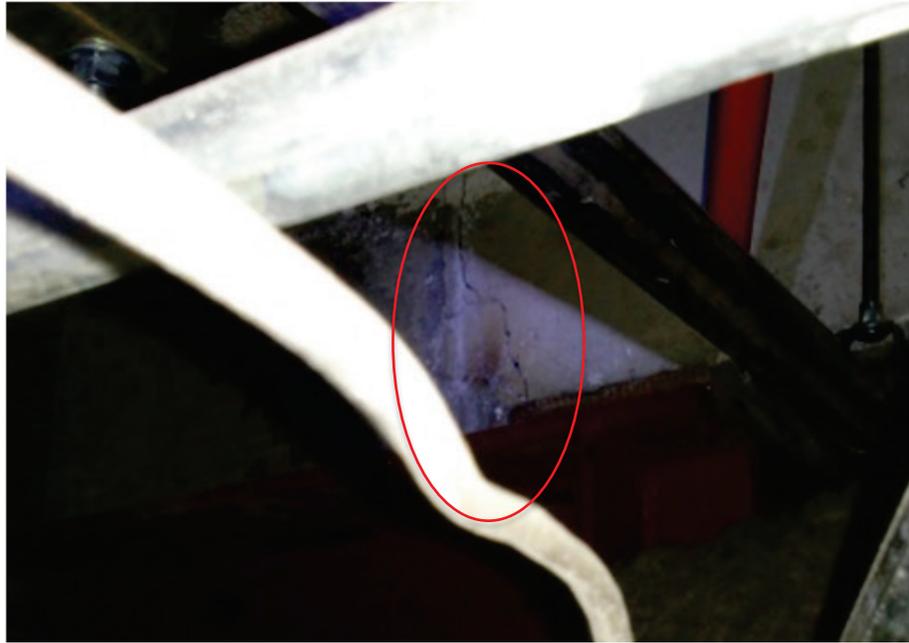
Damaged concrete beam at the third floor of BLD-01650.
